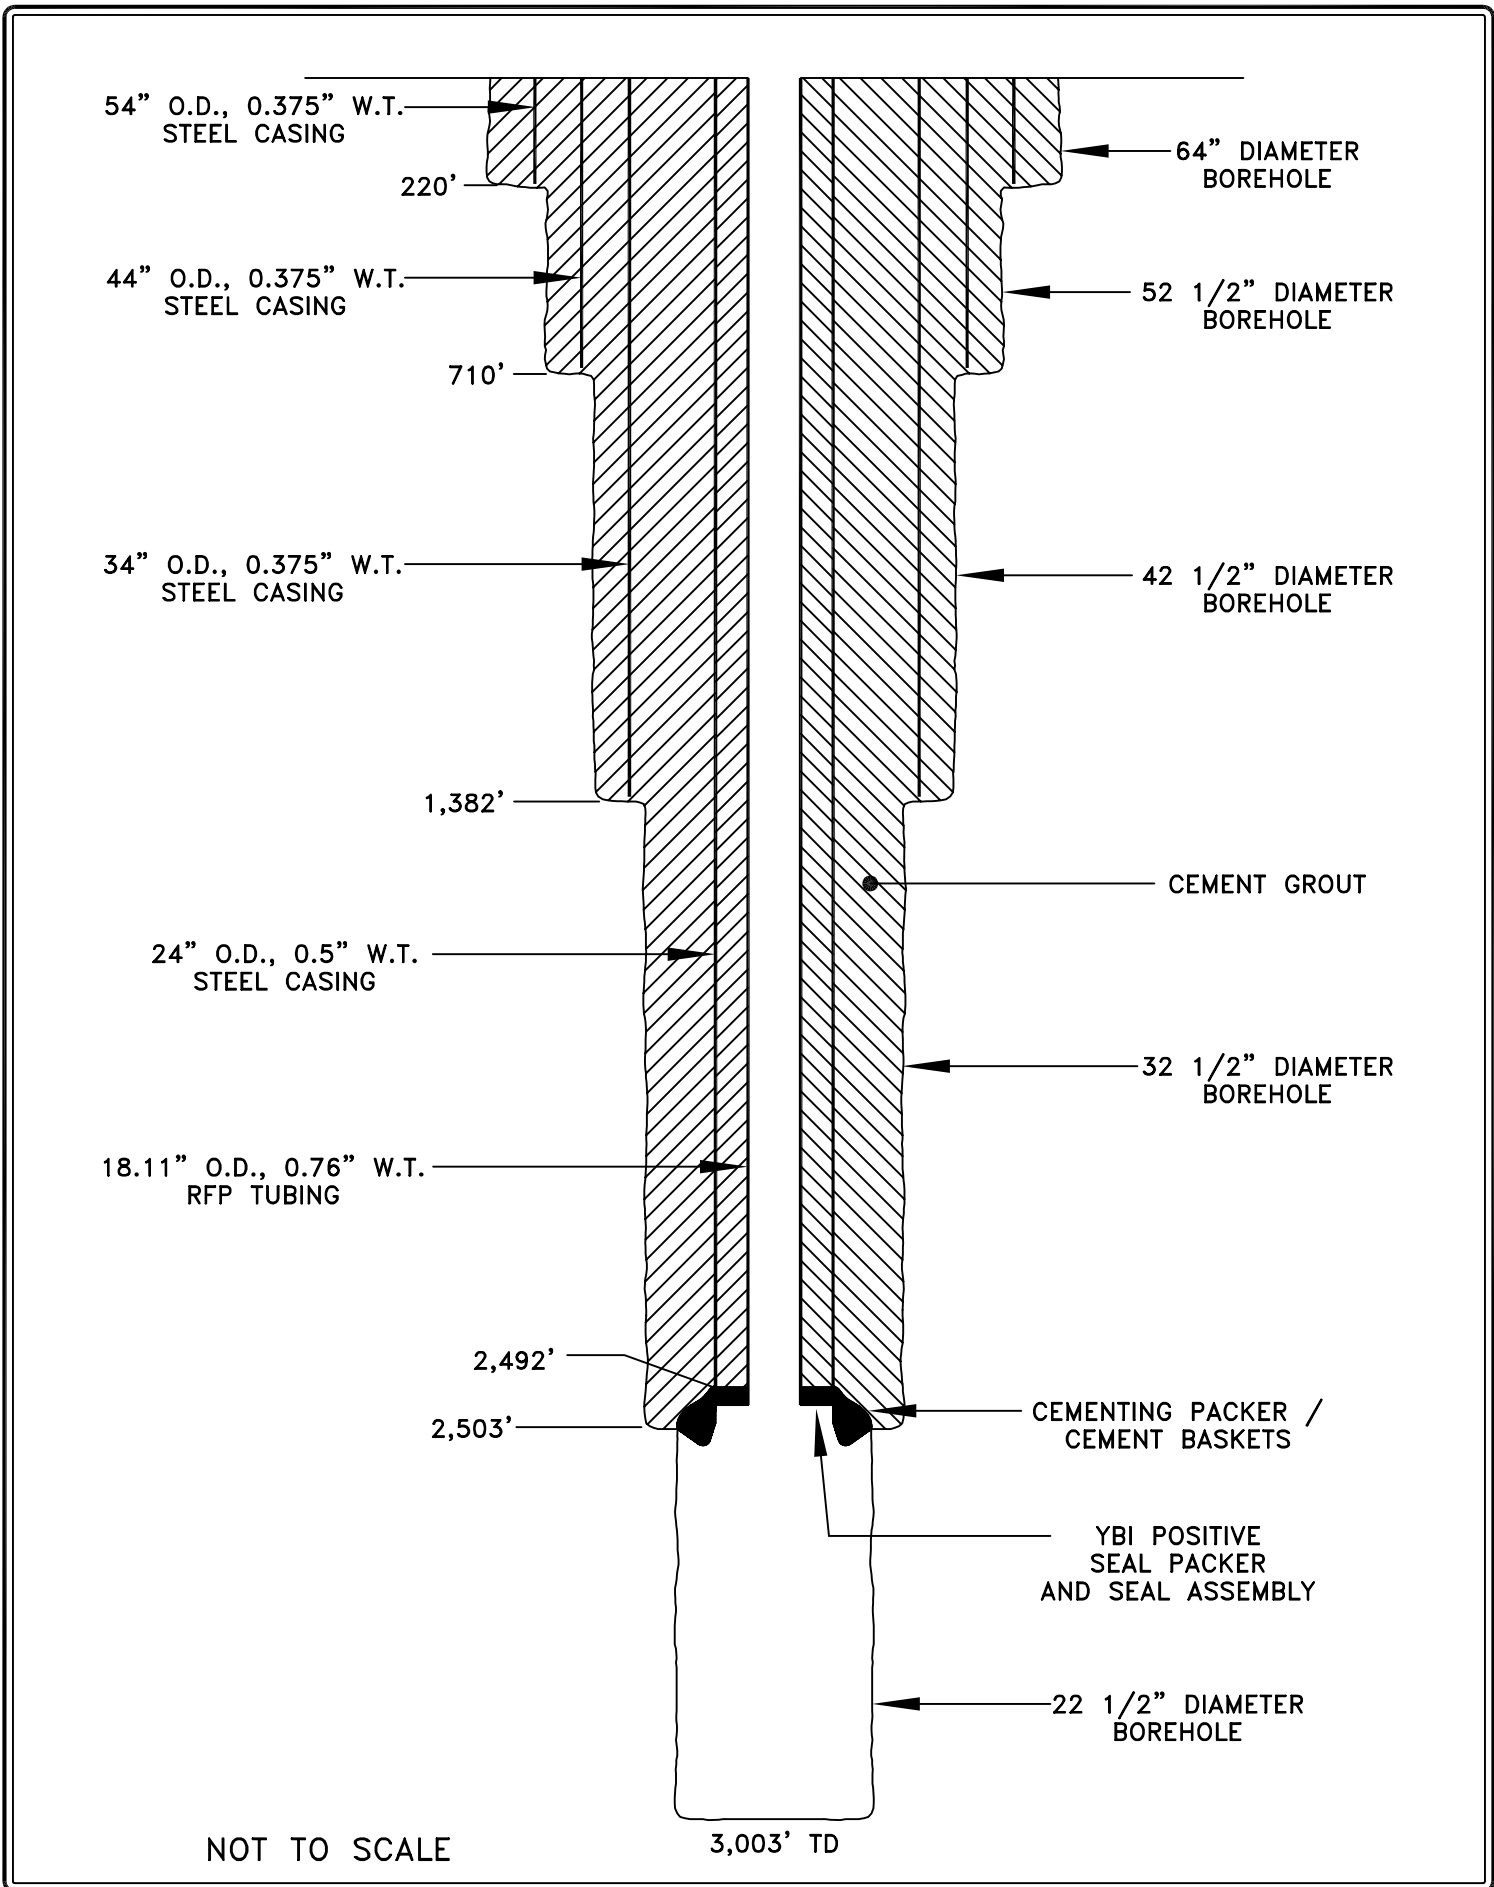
SCHEMATIC DIAGRAM SHOWING INJECTION WELL IW-2 CONSTRUCTION DETAILS.
